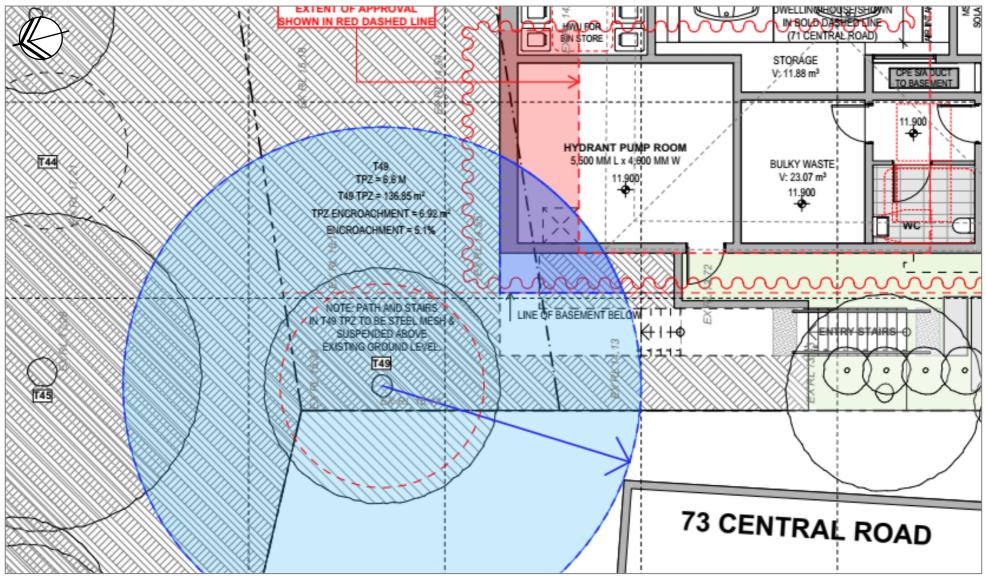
Excerpt of Ground Floor Plan, Dwg no. DA-03, Revision D-P9, dated 12 February 2024, authored by Gartner and Trovato Architects. (NOT TO SCALE).
